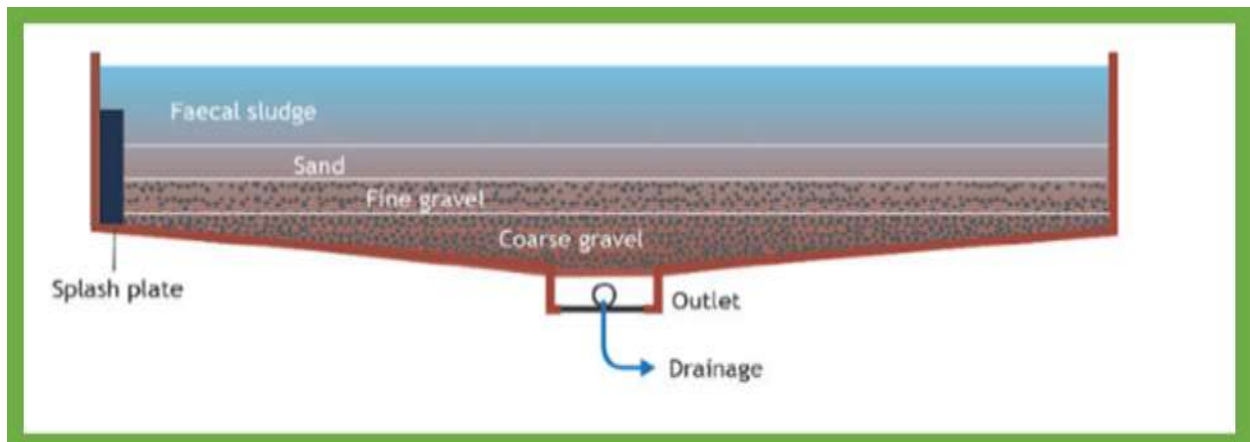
Cross section of an unplanted drying bed and its filter media.
